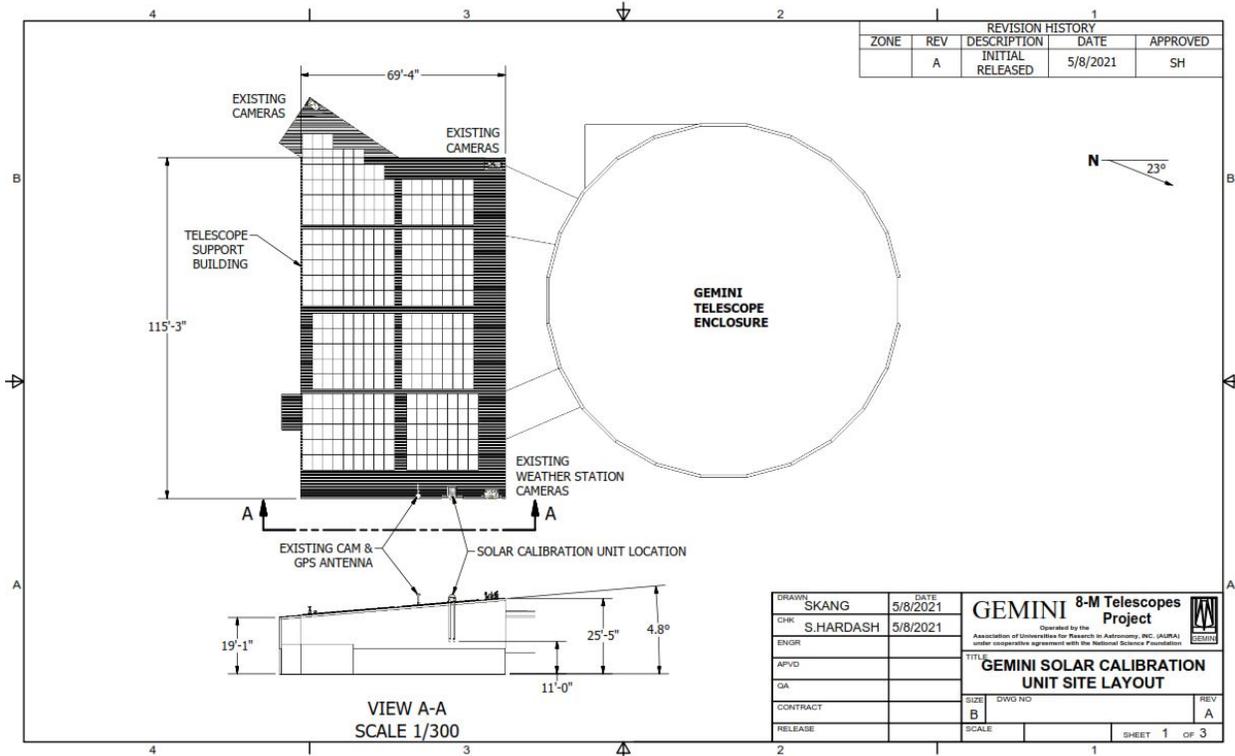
Gemini North facility showing the Telescope Enclosure to the right and the Support Facility in the left portion of this figure.
